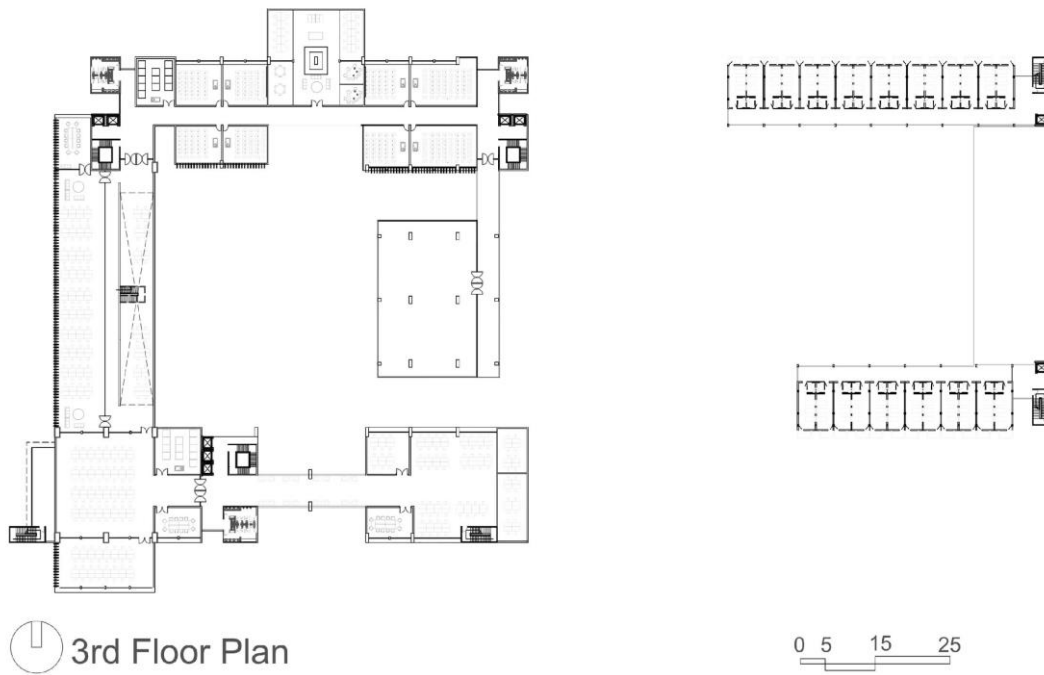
3rd floor plan,Source (Source:Author,2021)
